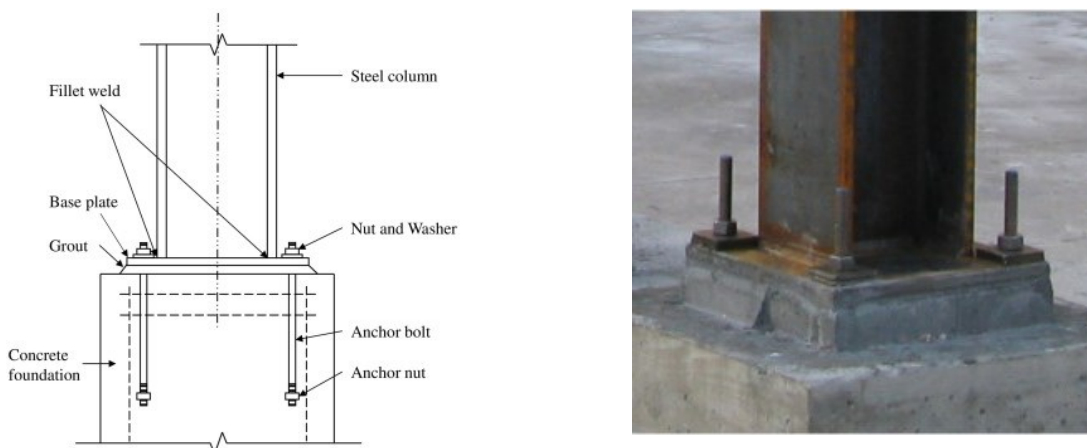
Typical Exposed Column Base joint [e.g., 49-54].
